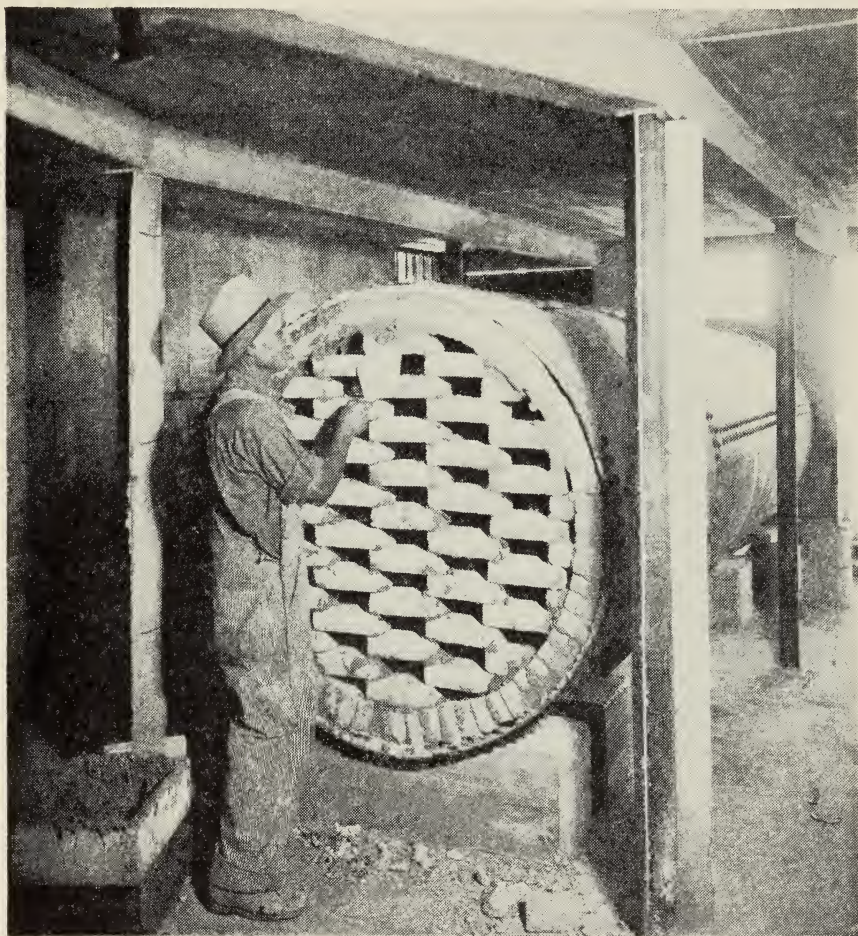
Construction of a terminal checkerbrick baffle in a furnace tube for a direct-heat oil burner. (Courtesy of the Fresno Dehydrating Company.)
